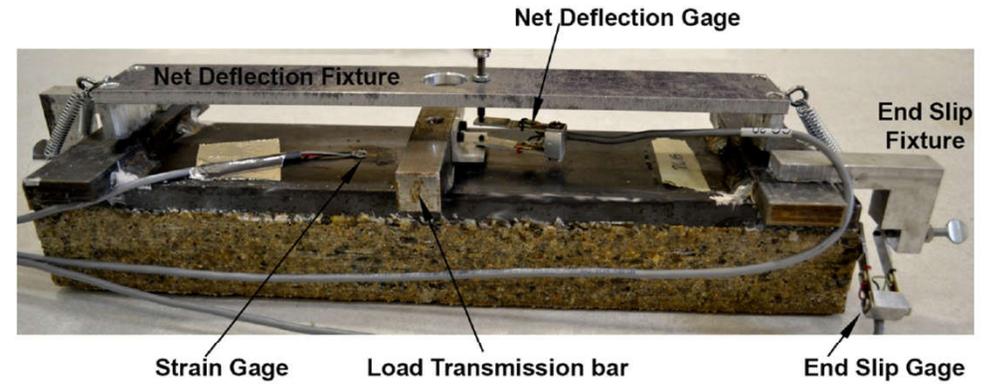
Composite specimen with displacement measurement and loading fixtures attached
